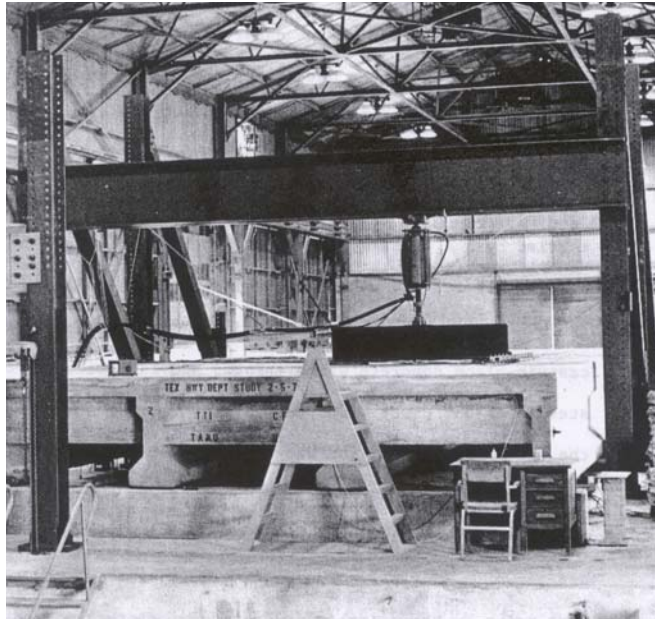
Full-scale Bridge Deck Specimen (Buth, et al. 1972)
